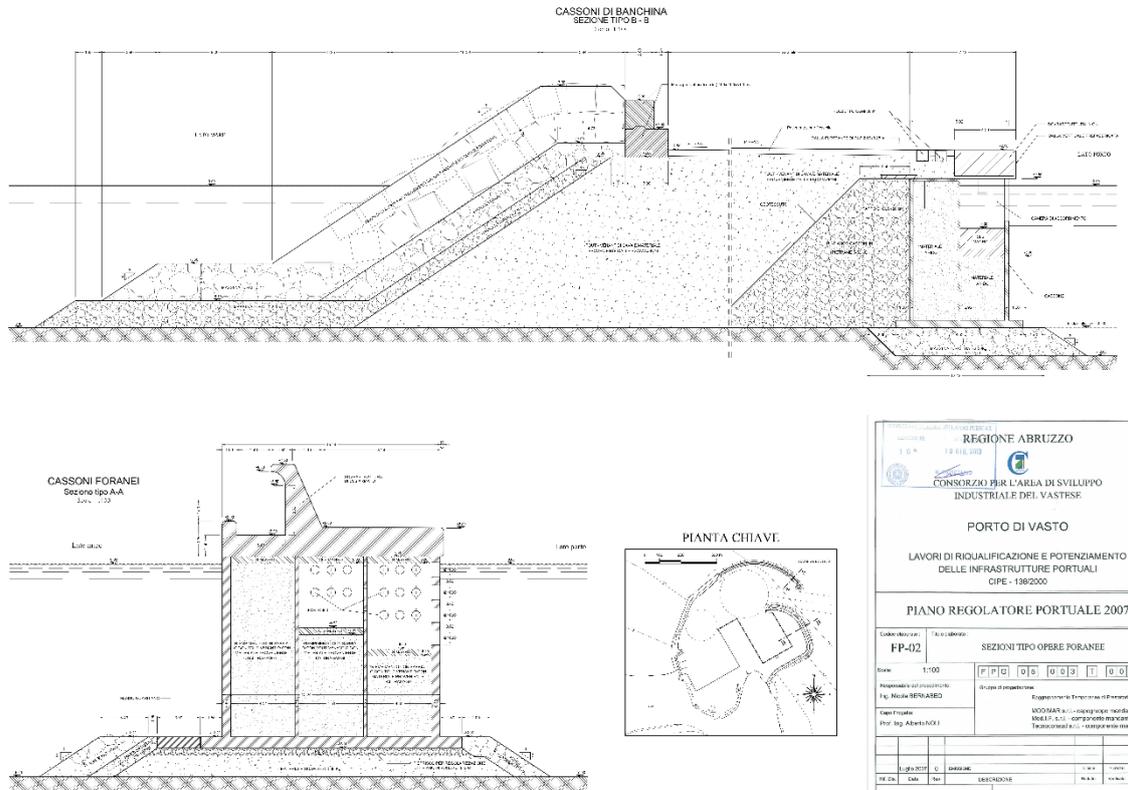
Approved Structural Plan of Vasto Marina. Sections of breakwater systems
